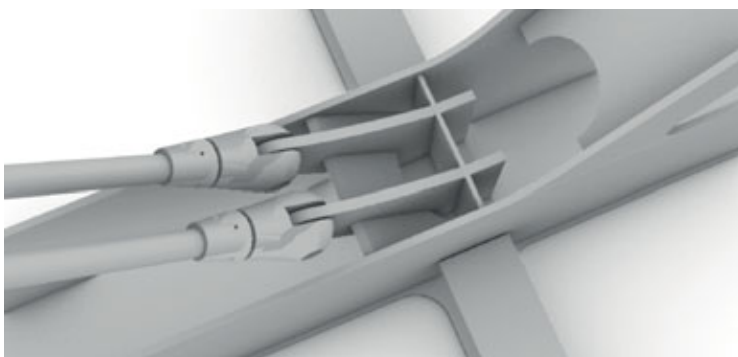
Detailed modelling of the joint between diagonals, cross beams and bottom chord of the truss (credit: © bEST Ingénieurs Conseils)
